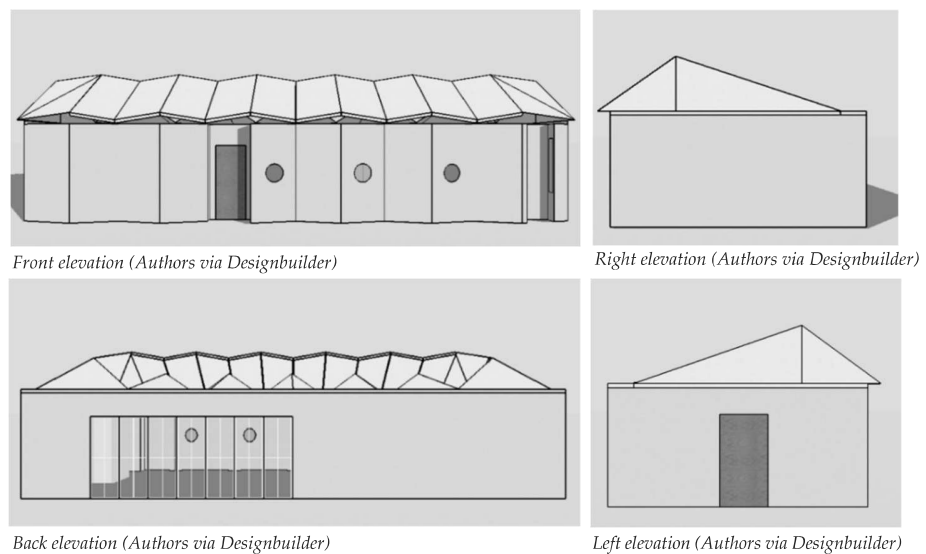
Elevations (Authors via DesignBuilder). Image 7.4.4—Back elevation (Authors via DesignBuilder).
